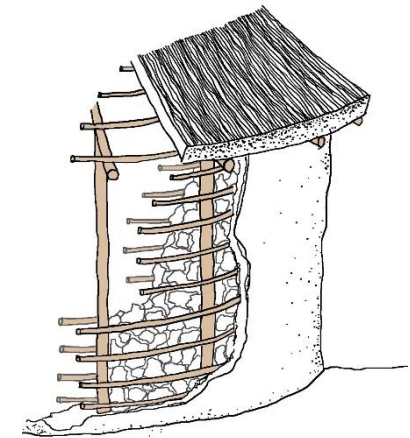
Earth Walls Being Used as Infill to Enclose Frame Structure
